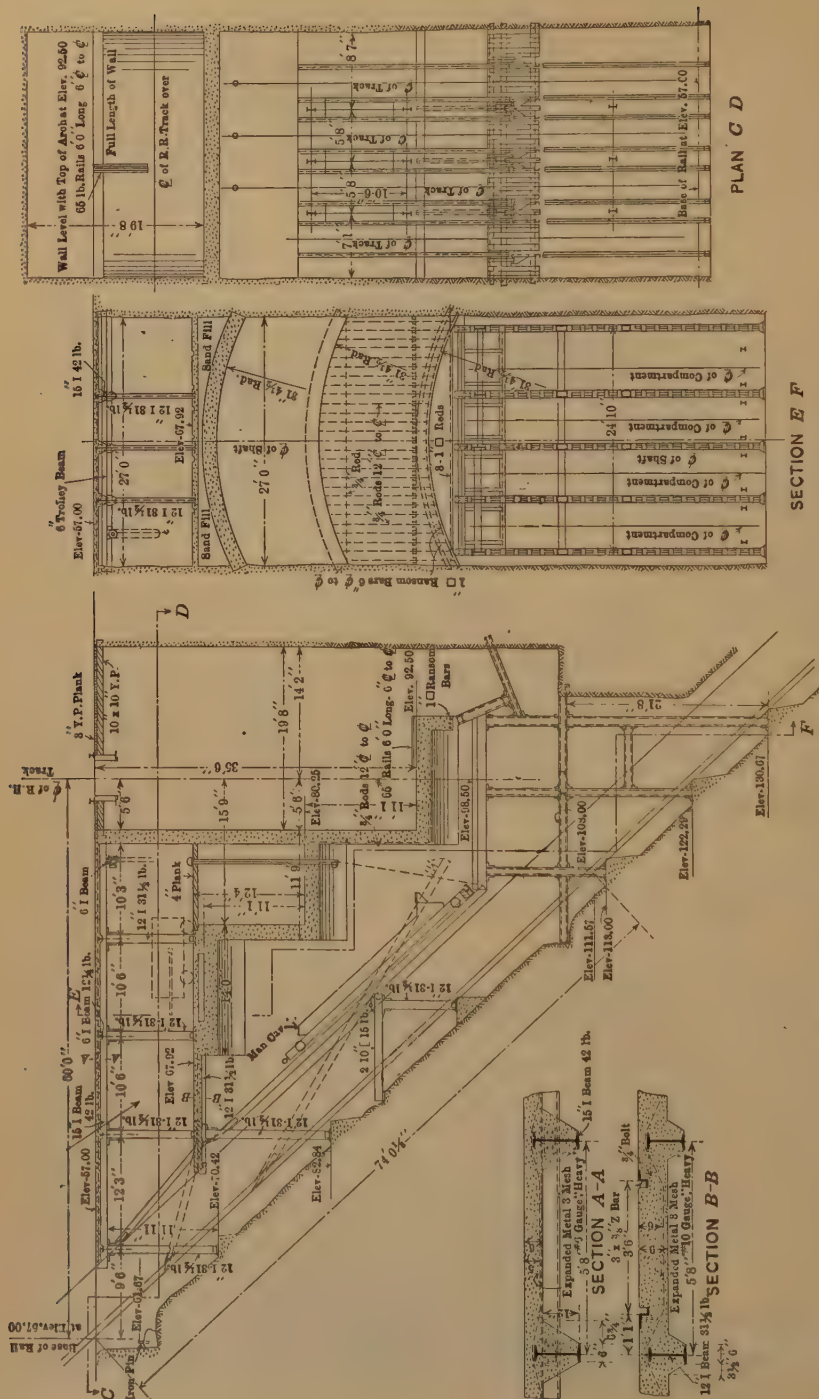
TOP LANDING, PALMER SHAFT, AND LOADING POCKET.
